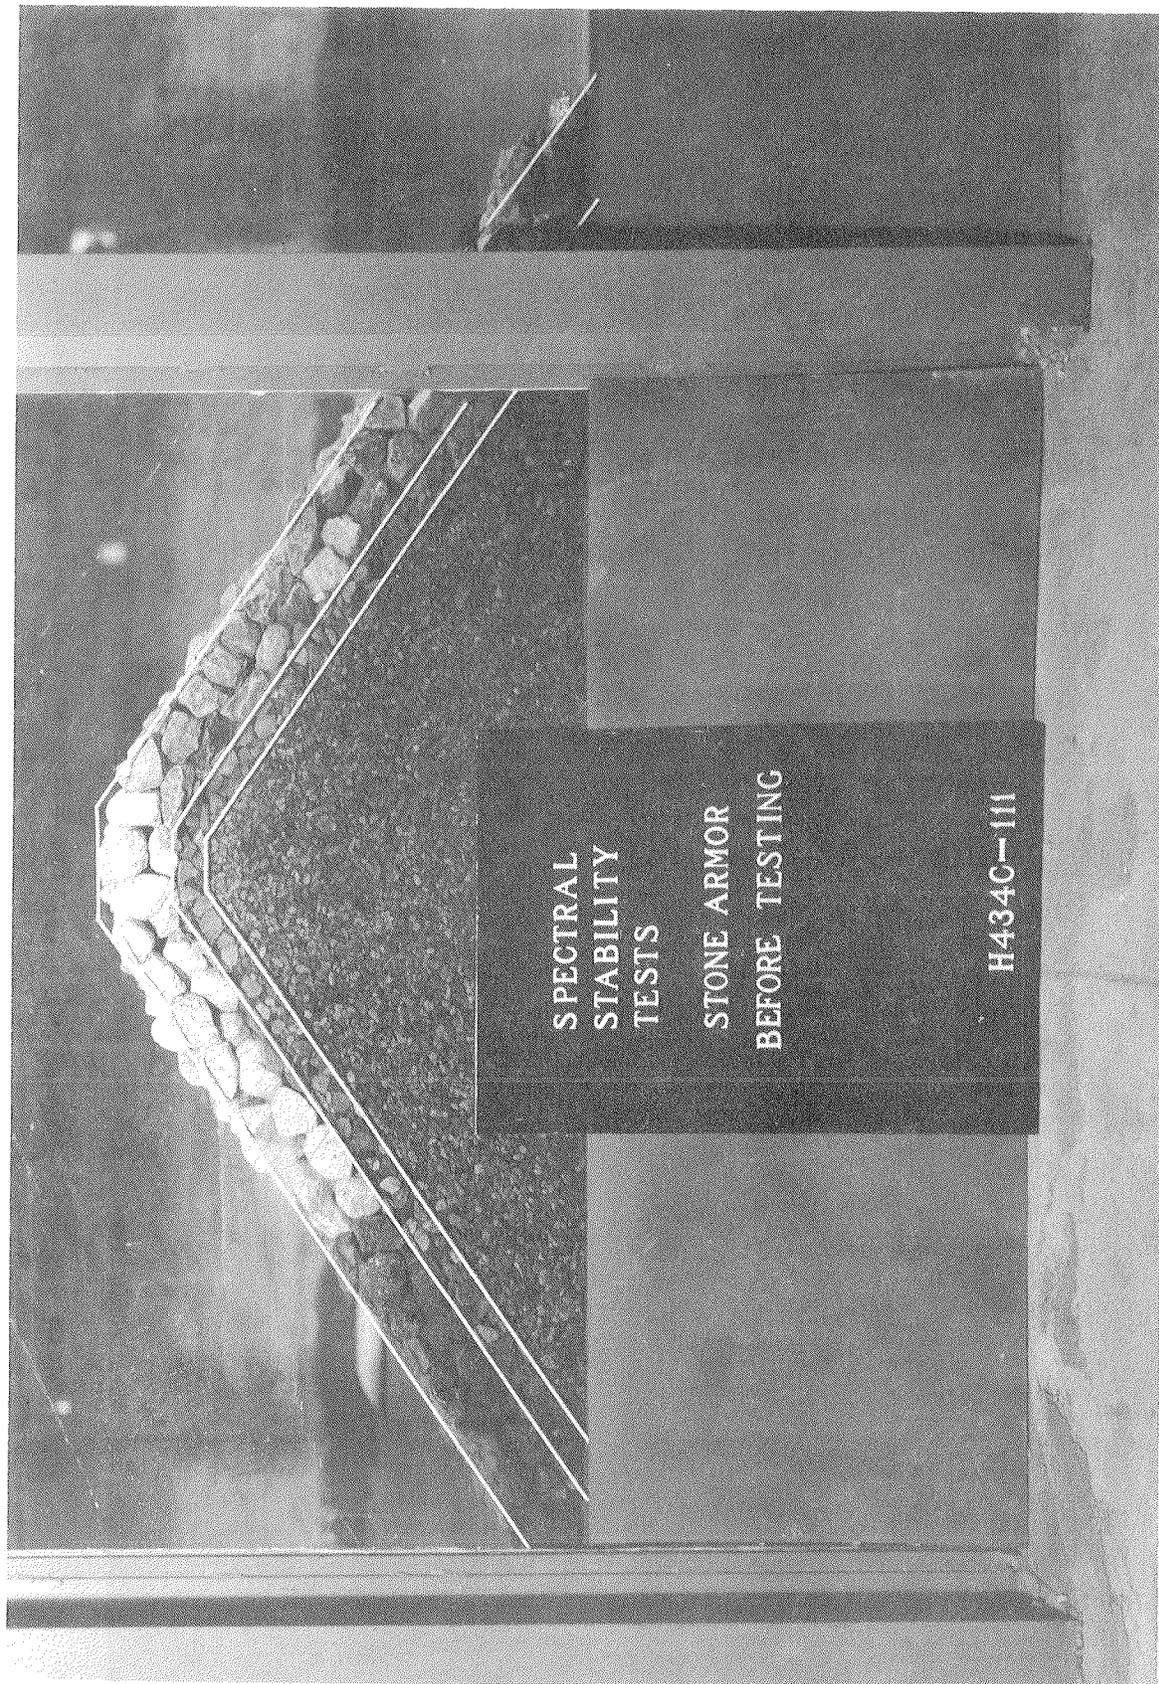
End view of a typical stone section before wave attack at a 1V on 1.5H seaside structure slope; $d = 1.0$ ft
